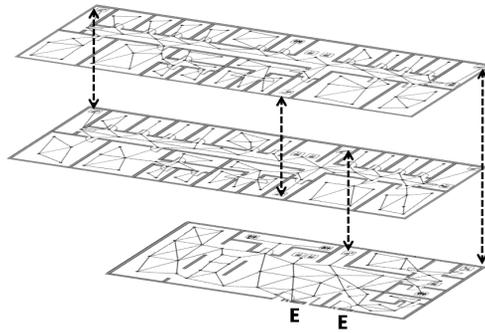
Three-storey building used in simulation experiments, depicting the inter-floor connections and building exits.
